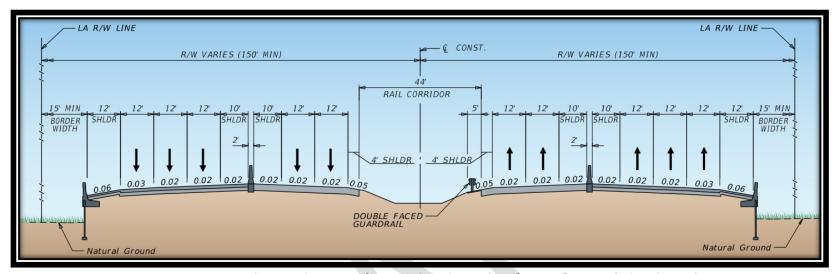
Proposed Typical Section (6+4 with rail envelope) – E. of Central Florida Parkway to SR 528
